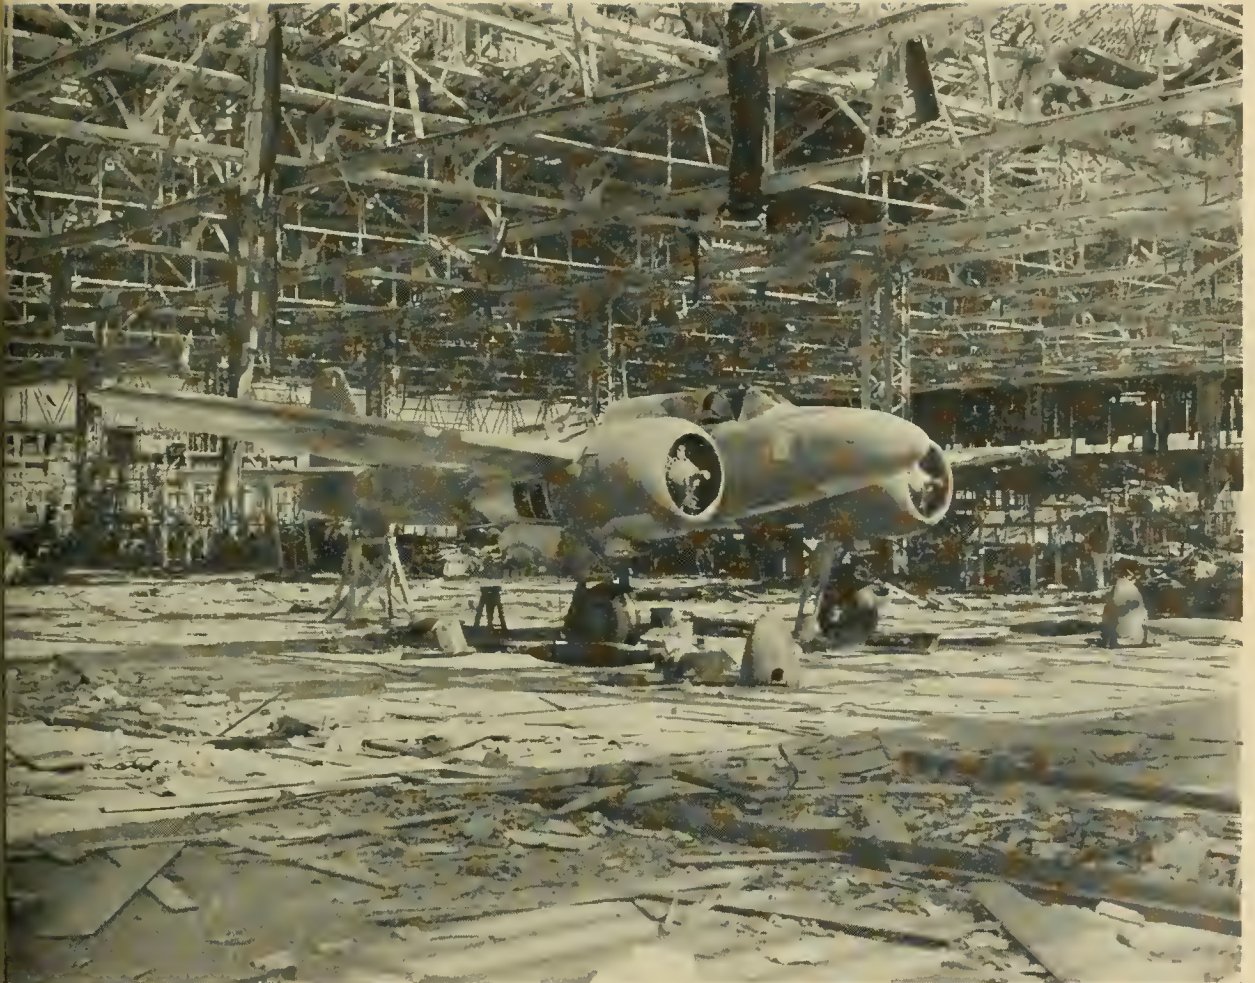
Randy (Ki-102) fighter in experimental building at Kagamigahara. This plane was manufactured at Akashi and was brought to the experimental center at Kagamigahara. This picture shows in detail typical building damage.
